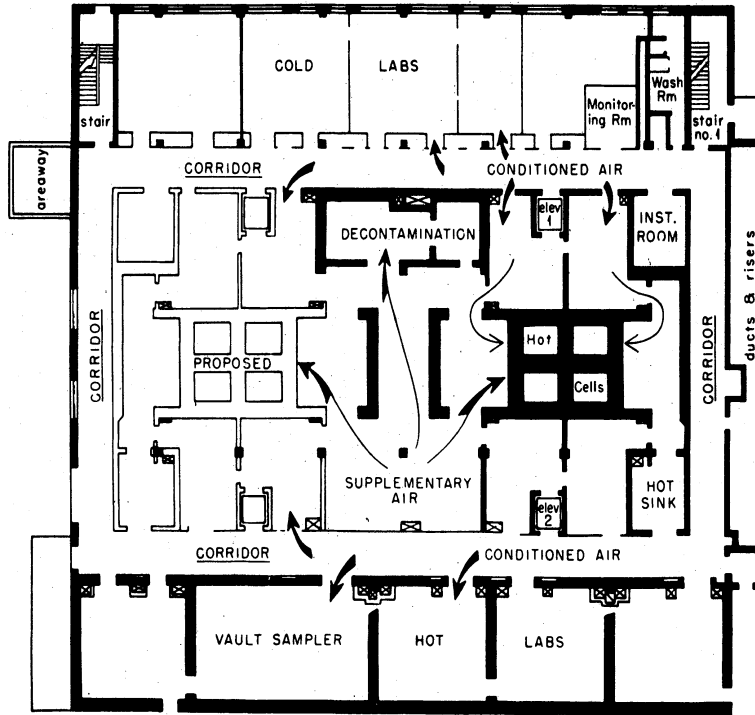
Floor plan of a radiochemical laboratory building with radiation zoning and airflow planning (6)
